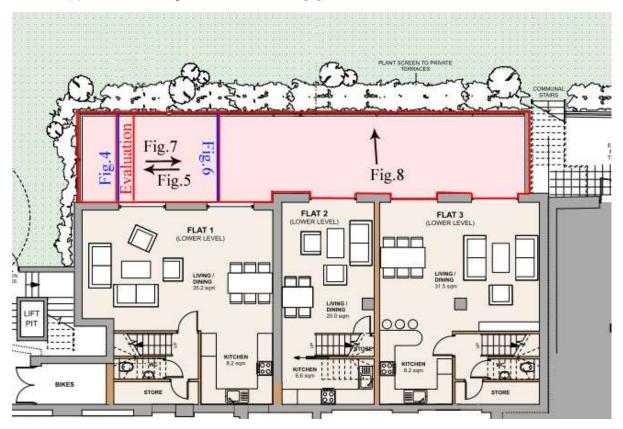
Site plan showing location of observations / sections and photographs (sections marked in blue)
